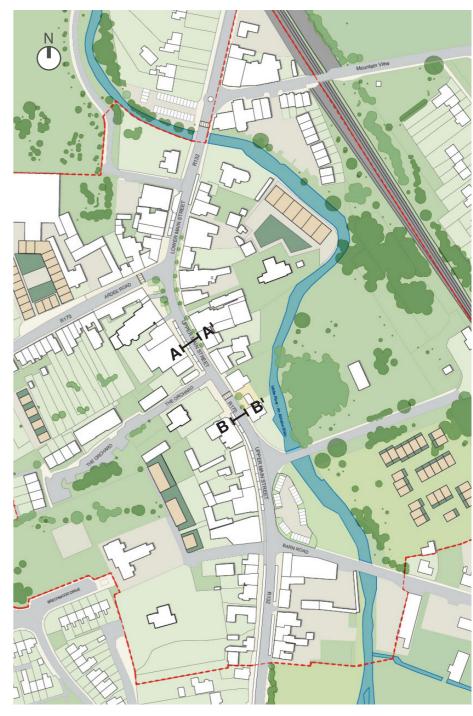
Illustrative plan of proposed interventions in the town centre's roads and streets
